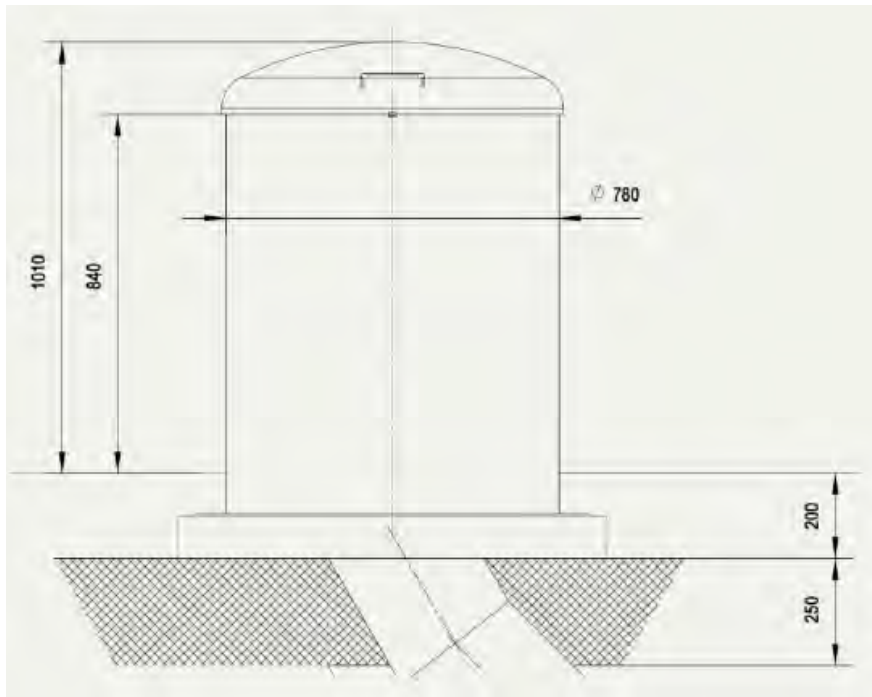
Typical Outlet Point Dimensions (Source Aerbin)
